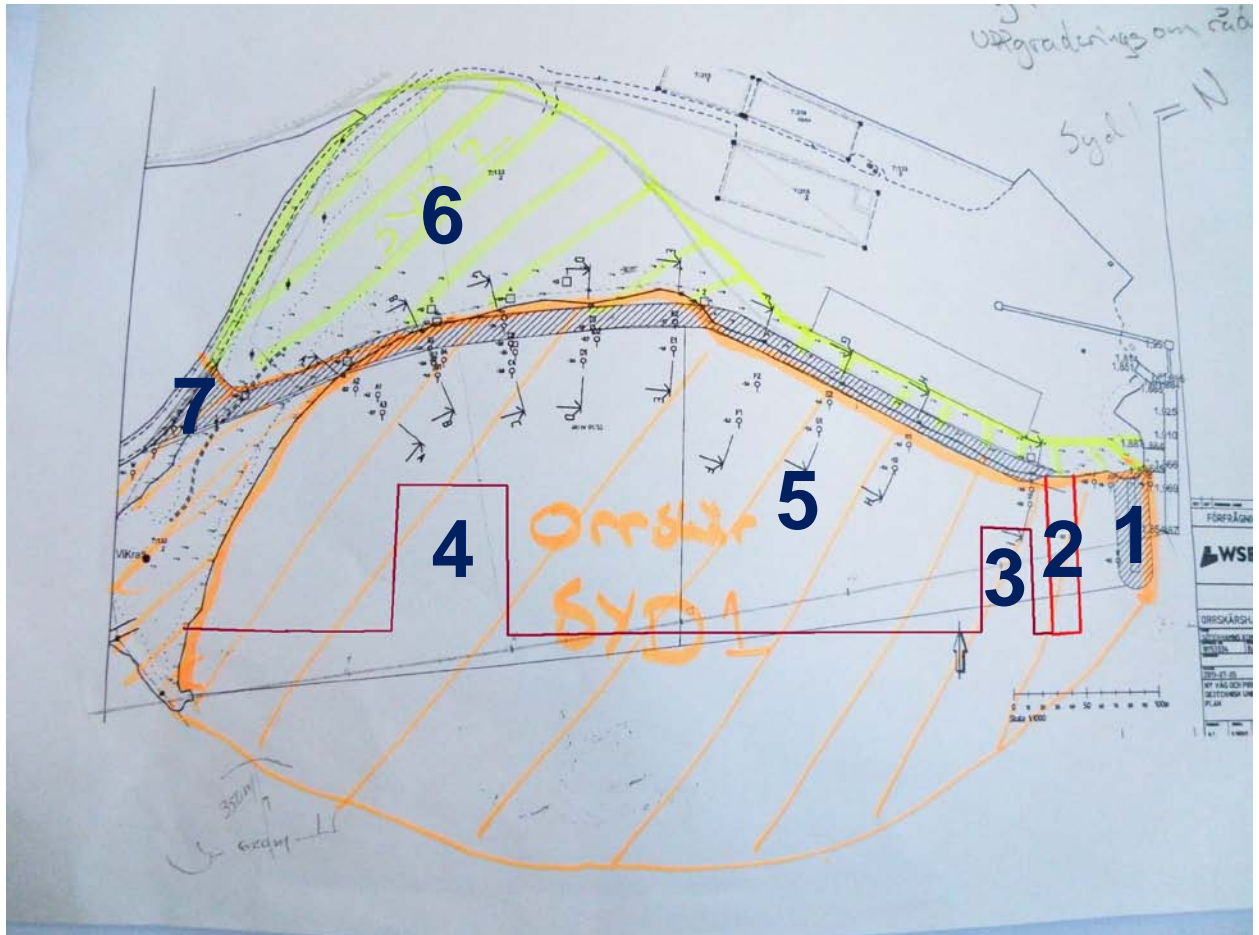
Project area. 1 - the old pier, 2 - the planned new pier, 3,4 – two docks to be built in 3 years, 5 – to be filled with concrete, 6 – creosote storage site, 7 – the harbour road. (Söderhamn Municipality)
